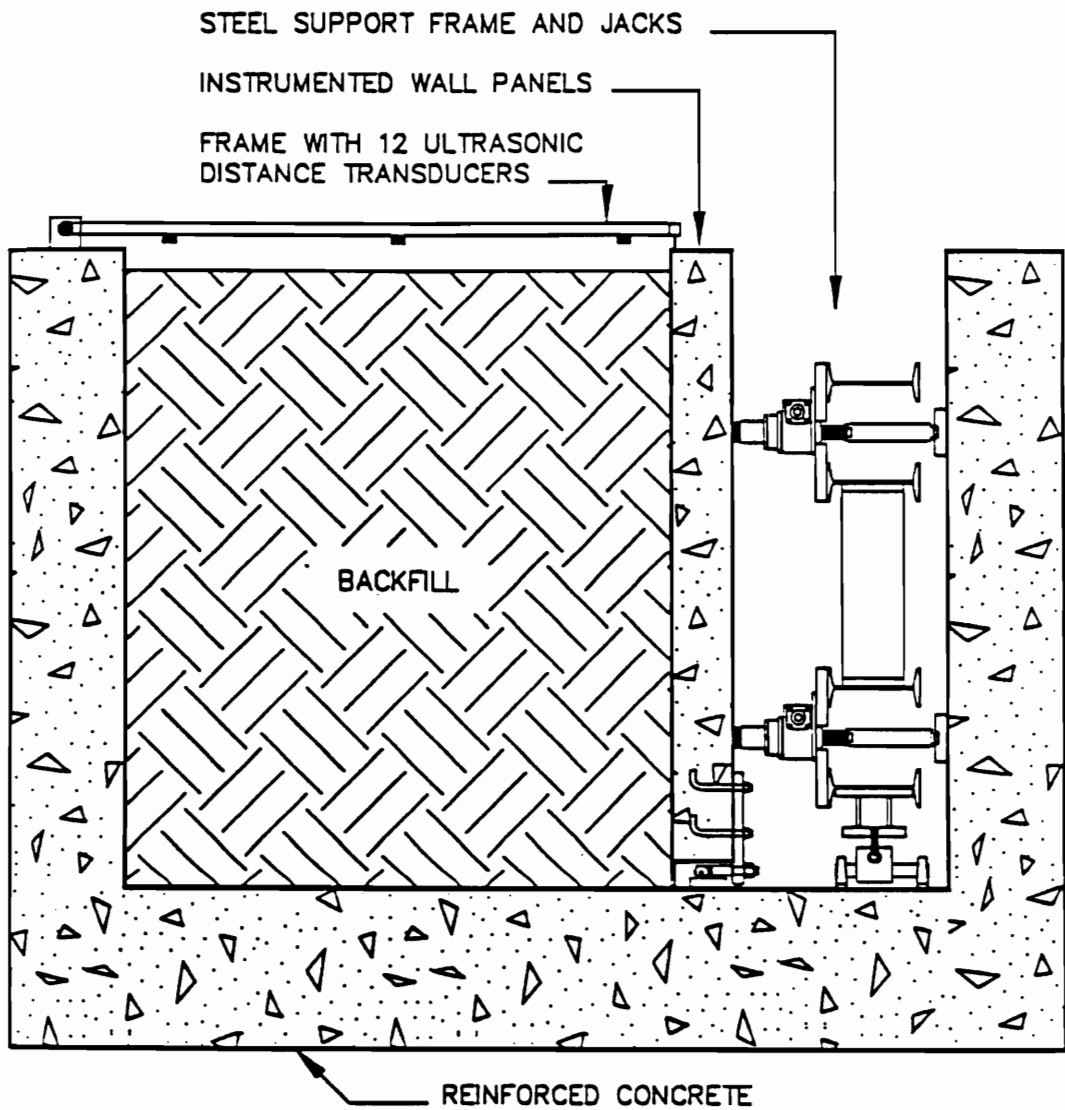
Cross-Section Through the Instrumented Retaining Wall Facility (after Sehn and Duncan, 1990)
